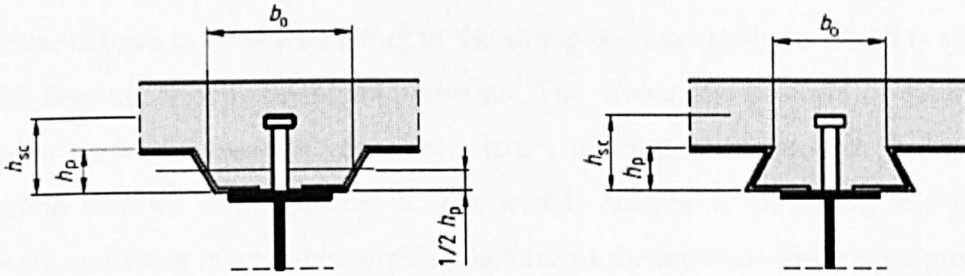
Beam with profiled steel sheeting parallel to the beam
